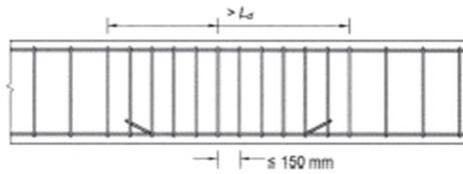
LAP LENGTH AT LOCATION OF SPLICING OF LONGITUDINAL BARS IN BEAM
